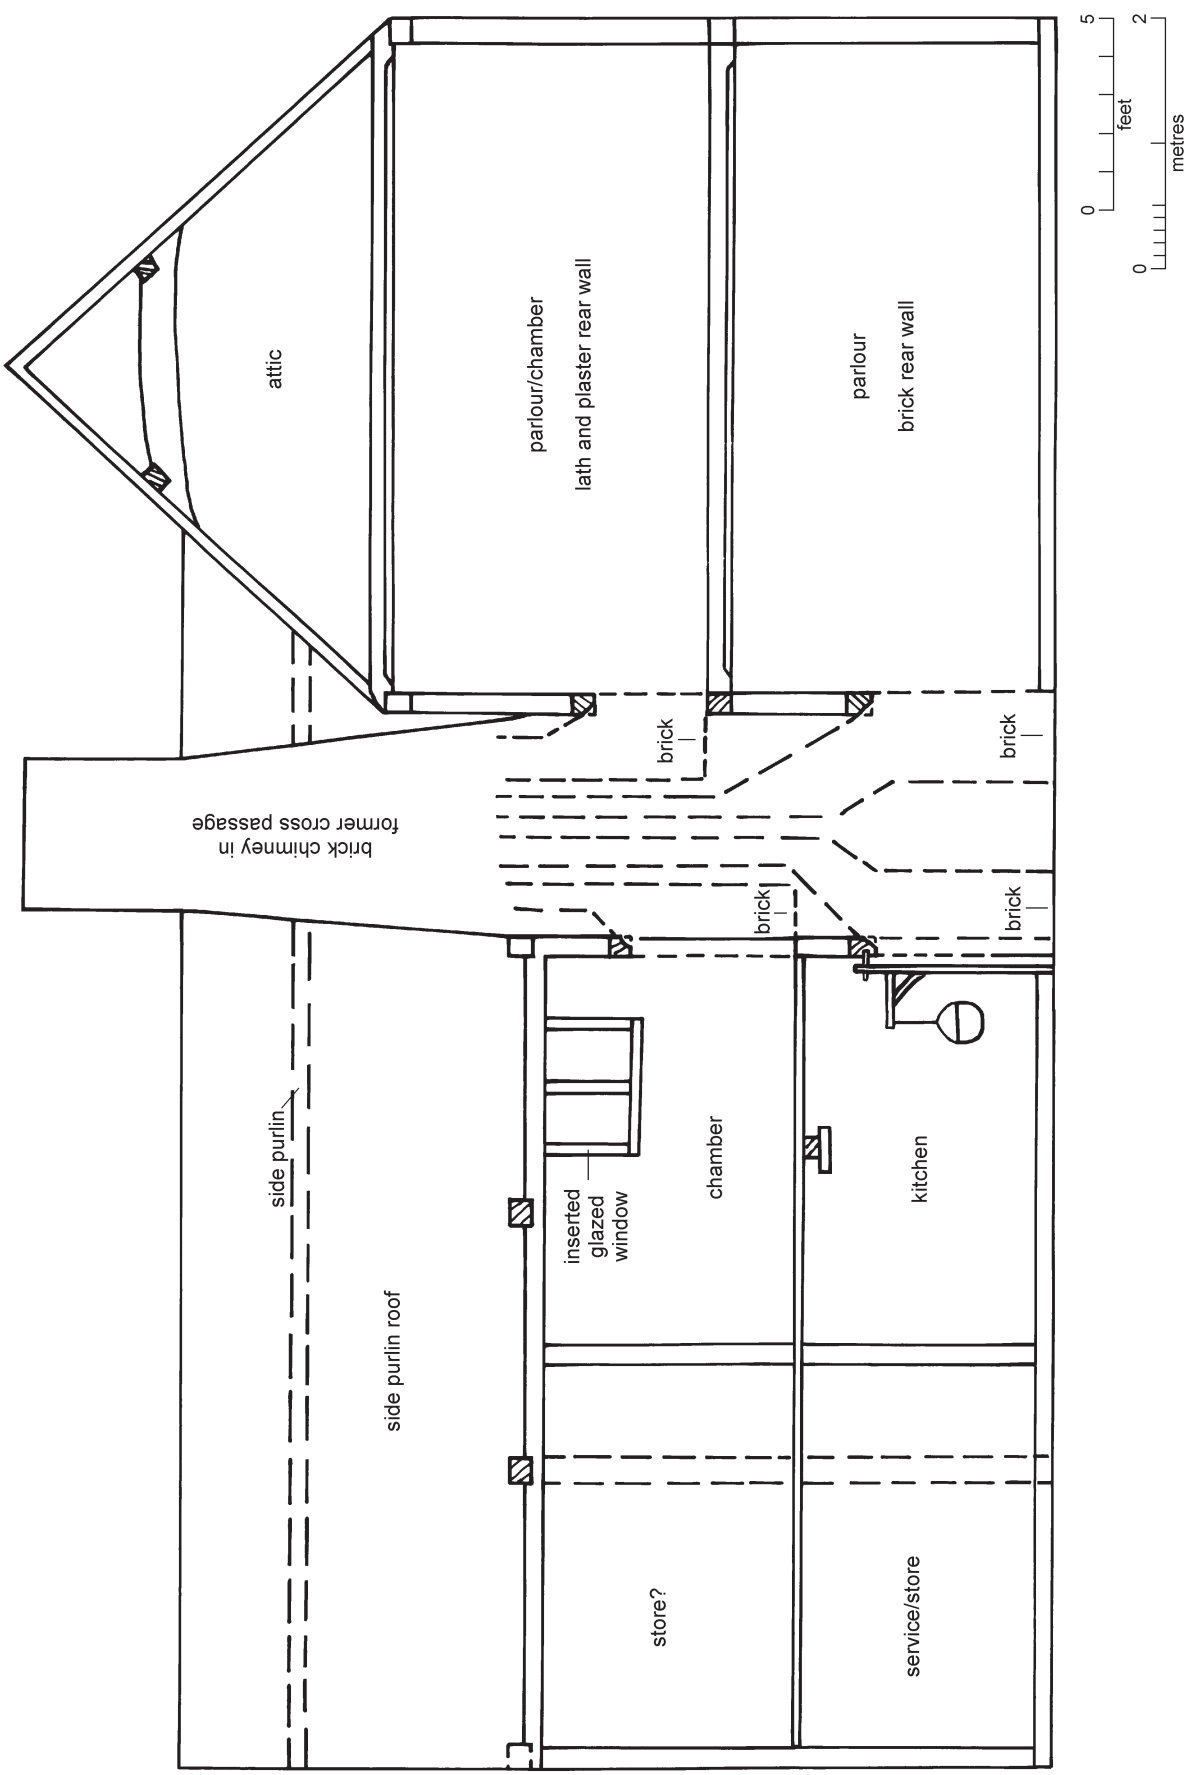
Hall-house, showing inserted floor, chimney and window and rebuilt crossing (later converted into Day's warehouse).
